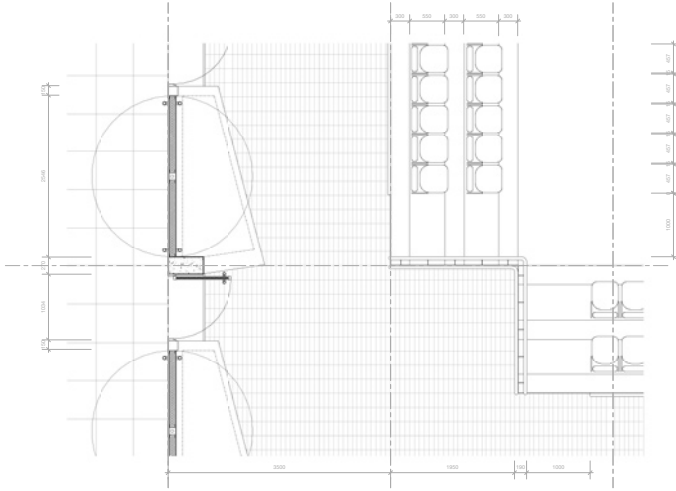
Detail floor plan of rotating acoustic facade panels
